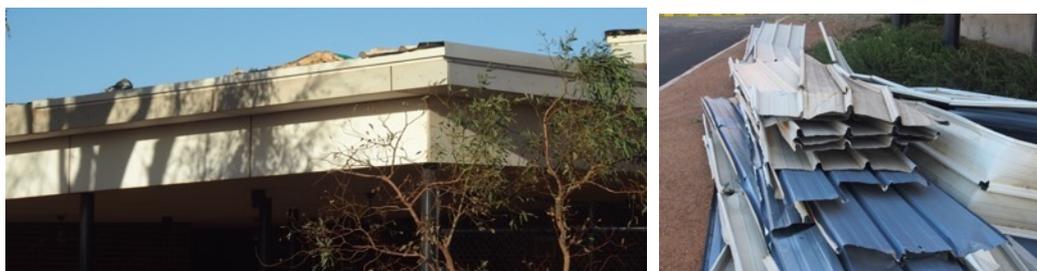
Failure of concealed-fixed roof cladding
